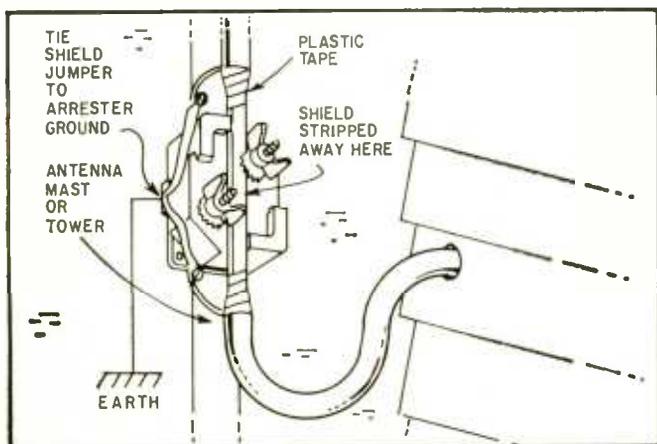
Before routing cable or twin-lead inside a building, be sure to use some form of lightning arrester. Ground it well.
